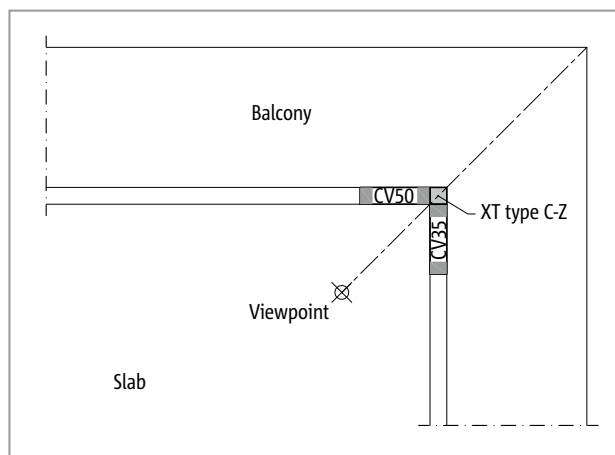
Schöck Isokorb® XT type C: Concrete cover selectable: Here CV50 left from viewpoint, concrete cover CV35 right from viewpoint
